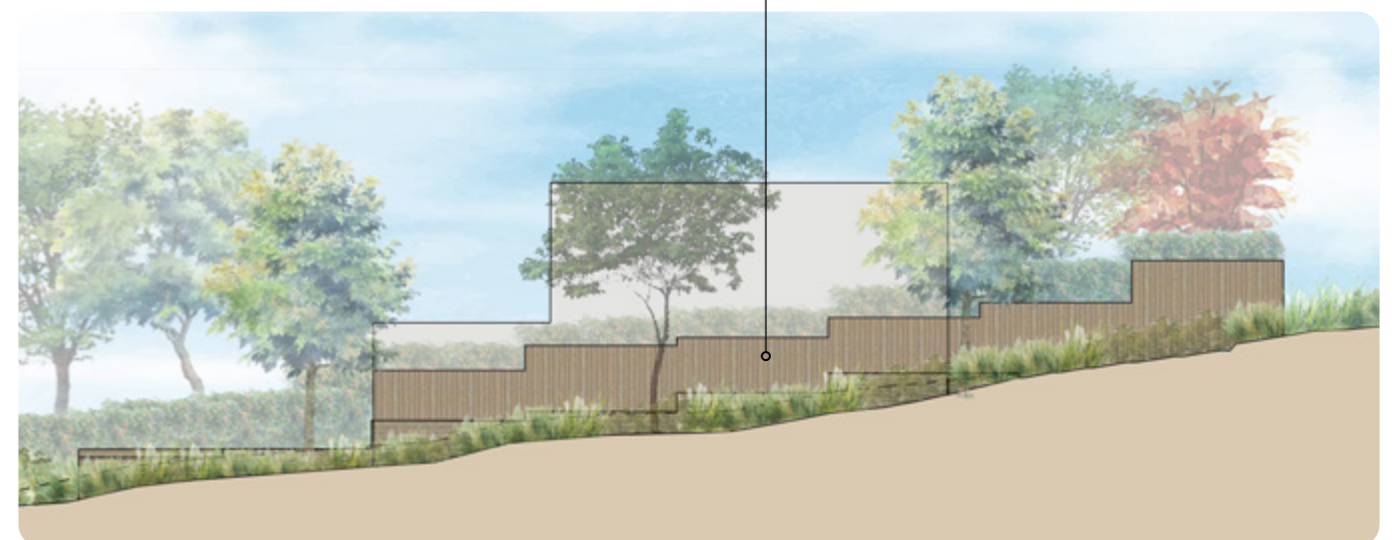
Detached Dwelling Elevation AA to Hospital Road
